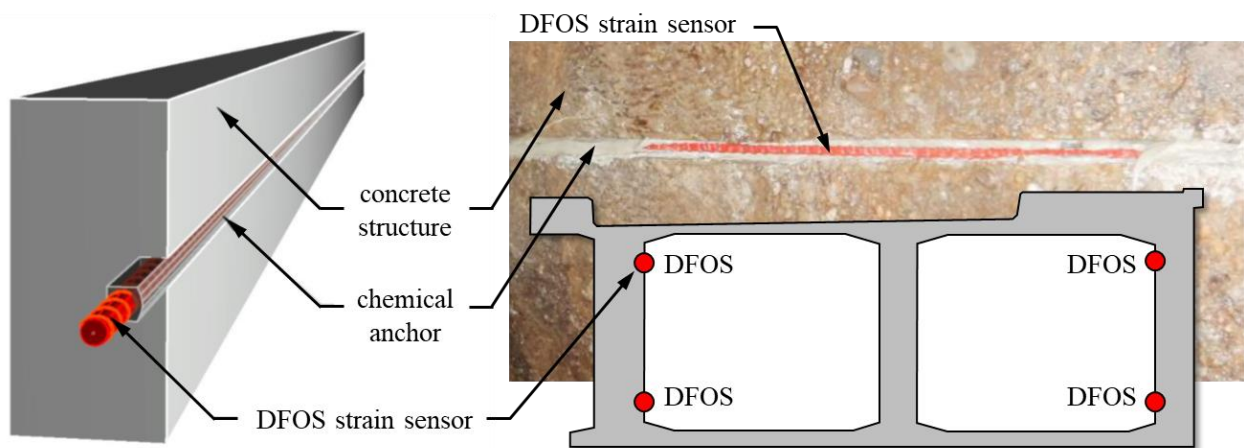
DFOS sensors on the cross-section of a box girder
